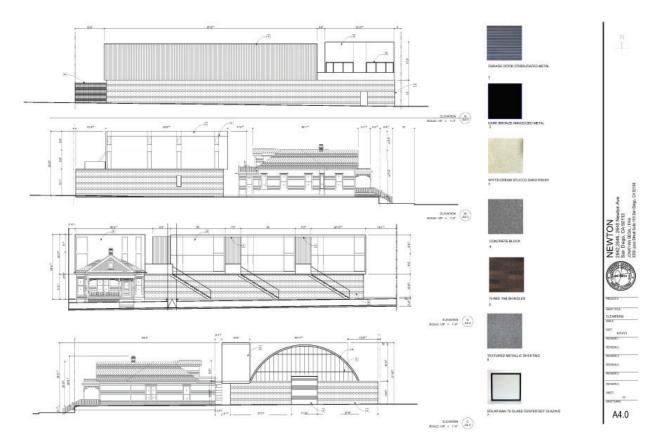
Proposed building elevations at the Newton Avenue site. Source: Matthew Segal.
